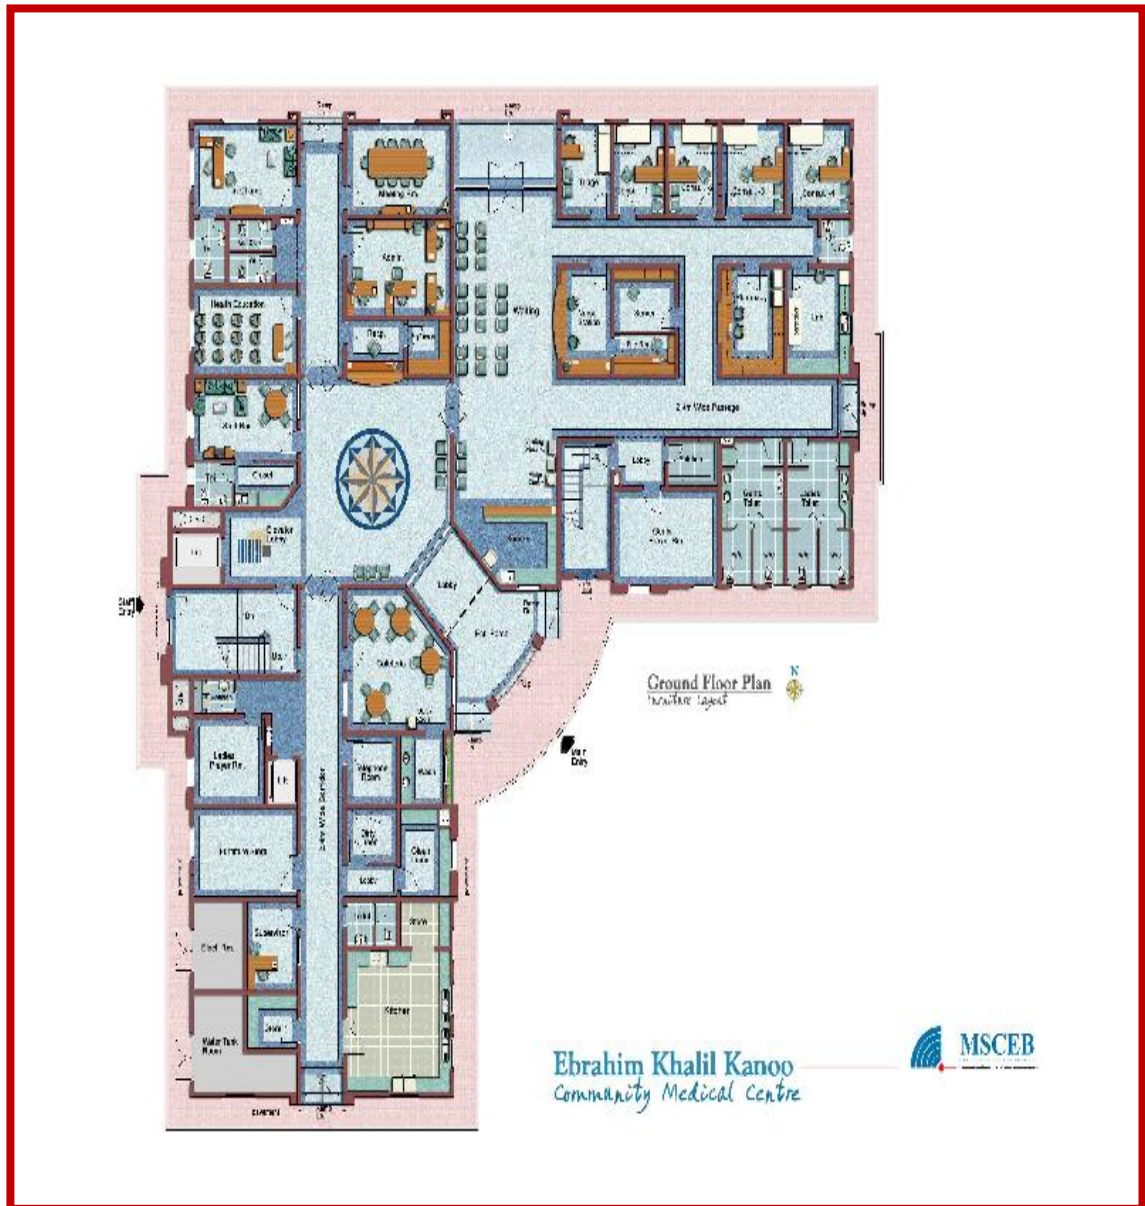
EKK Community Medical Centre – Ground Floor Plan
